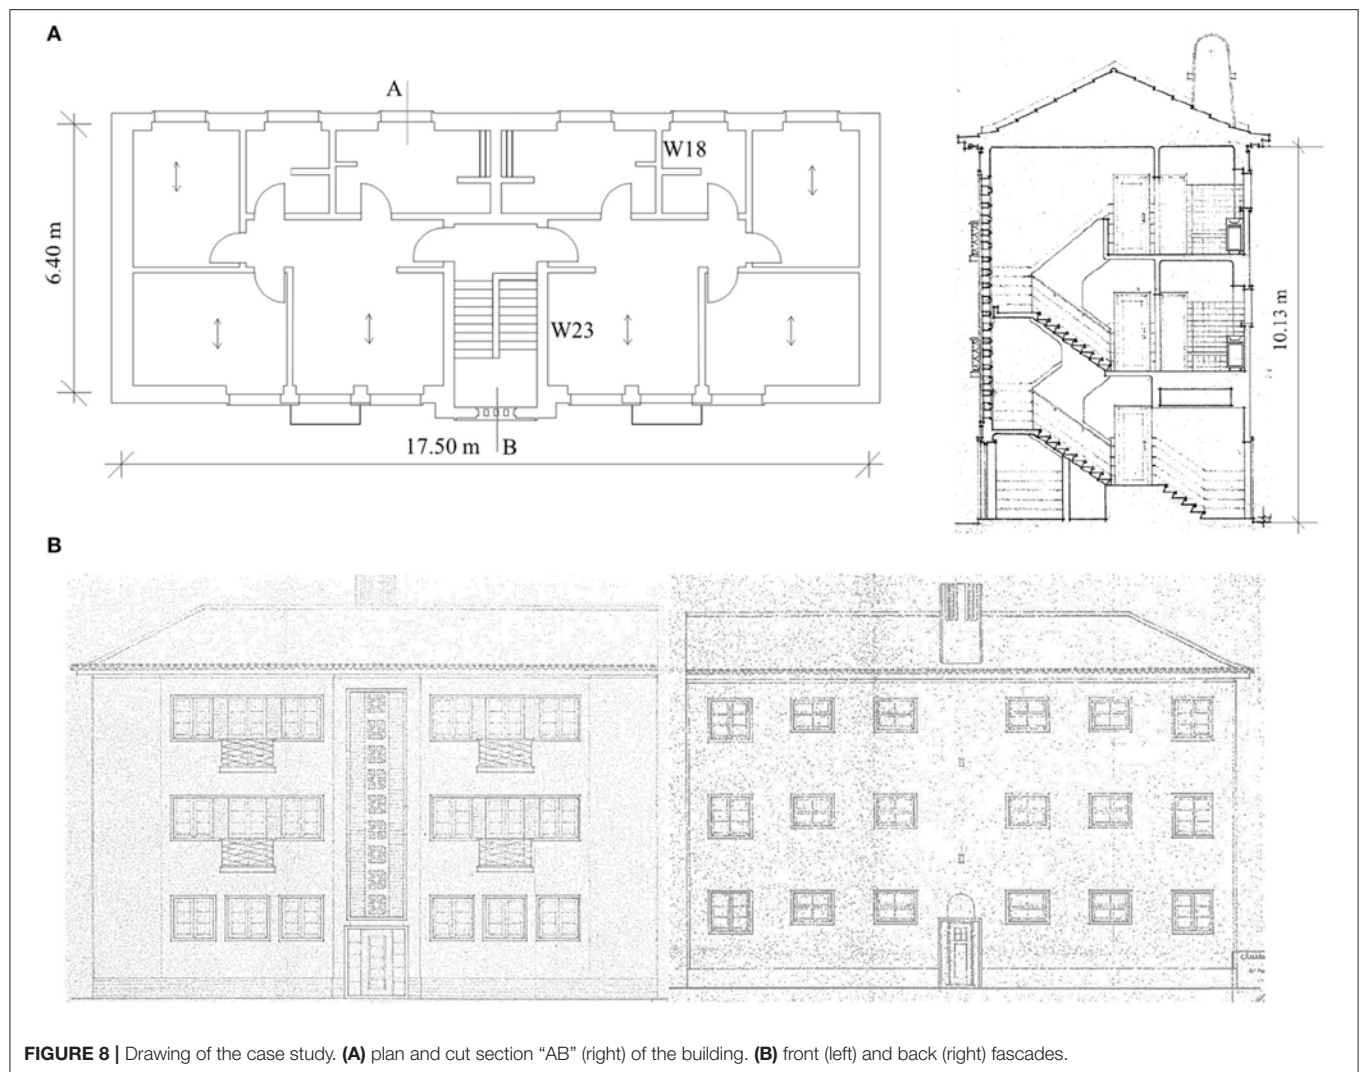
| Drawing of the case study. (A) plan and cut section “AB” (right) of the building. (B) front (left) and back (right) facades.
